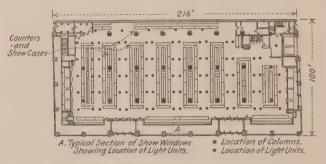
First floor plan of a department store showing lighting lay-out.
